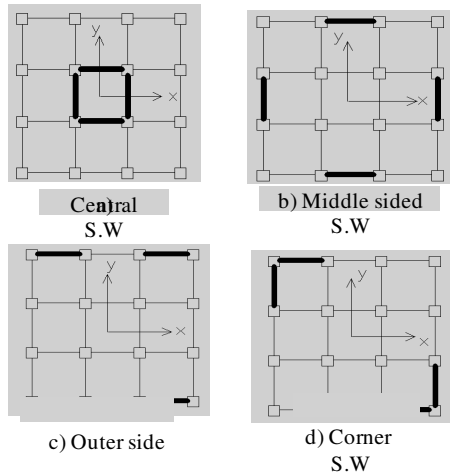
Geometric positions of shear wall in 10, 15, 20, 25 and 30 storey symmetrical buildings
